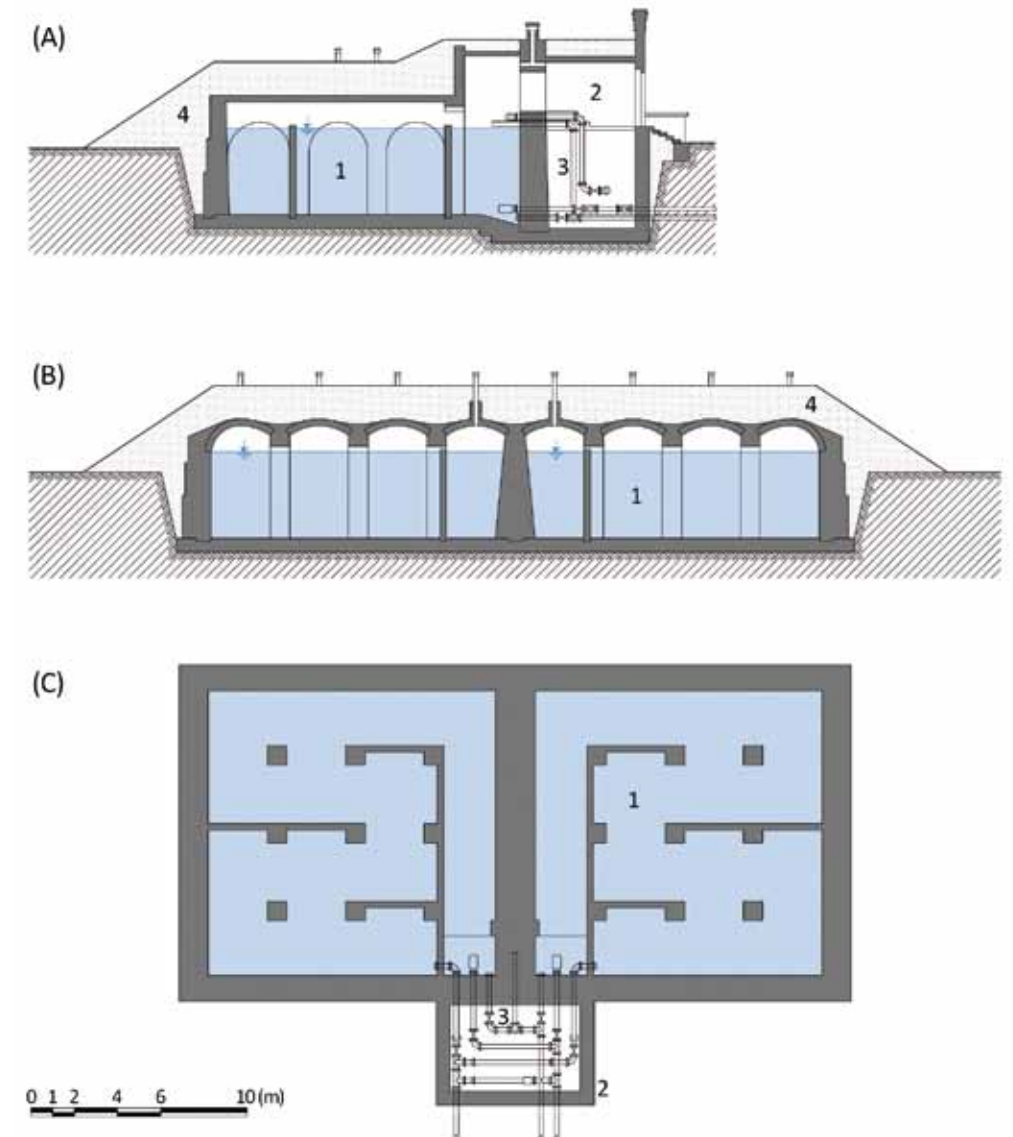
Prague-Michle – ground water tank in Zelená Liška (part of Vršovice waterworks), an example of ground brick water tank: (A) cross-section; (B) longitudinal section; (C) ground plan; 1 – water tank compartment / water tank meander chamber, 2 – valve chamber / control structure (building), 3 – inflow and outflow pipeline, 4 – earth embankment. Diagram by Radek Mišanec, 2021 (modified according to: Klír and Klokner, 1923).
